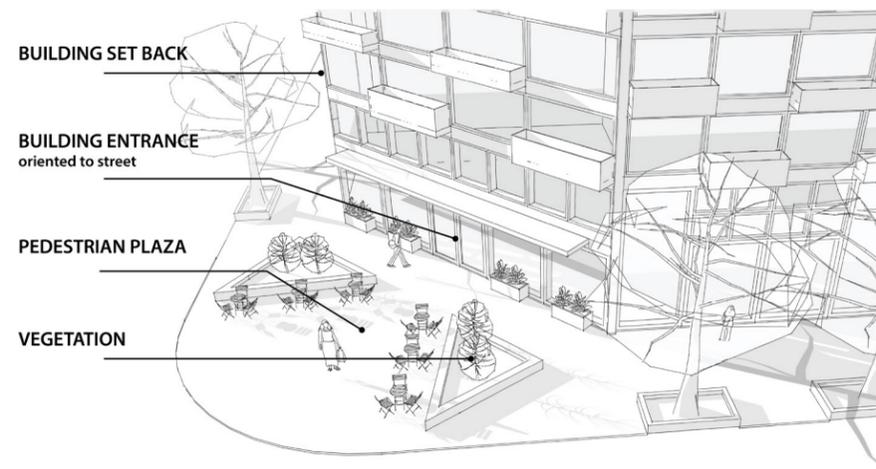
Principal buildings on corner sites should have a grand entrance from the sidewalk and offer a public space.
